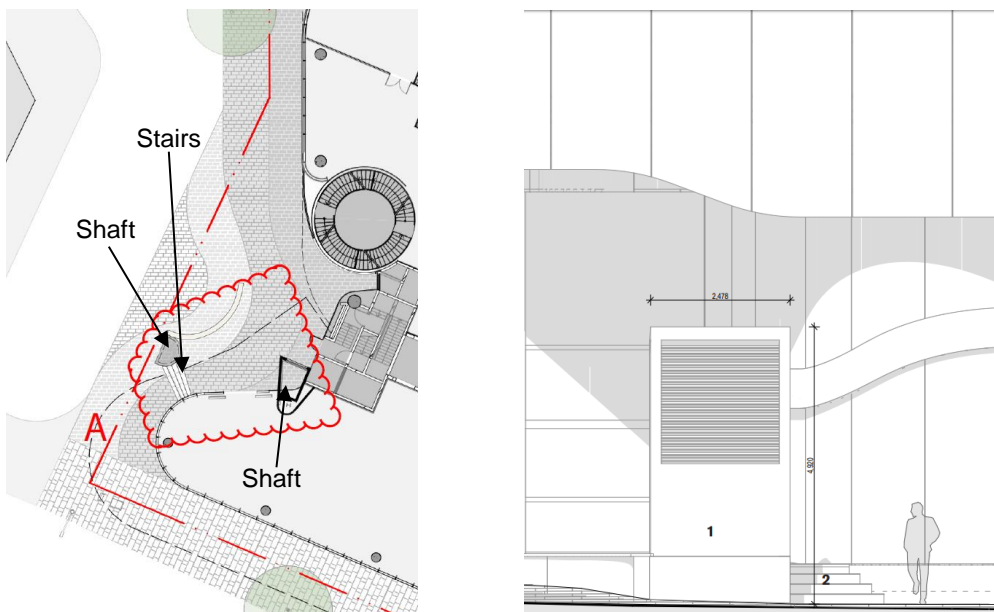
Proposed Substation Ventilation Shaft and Stairs
